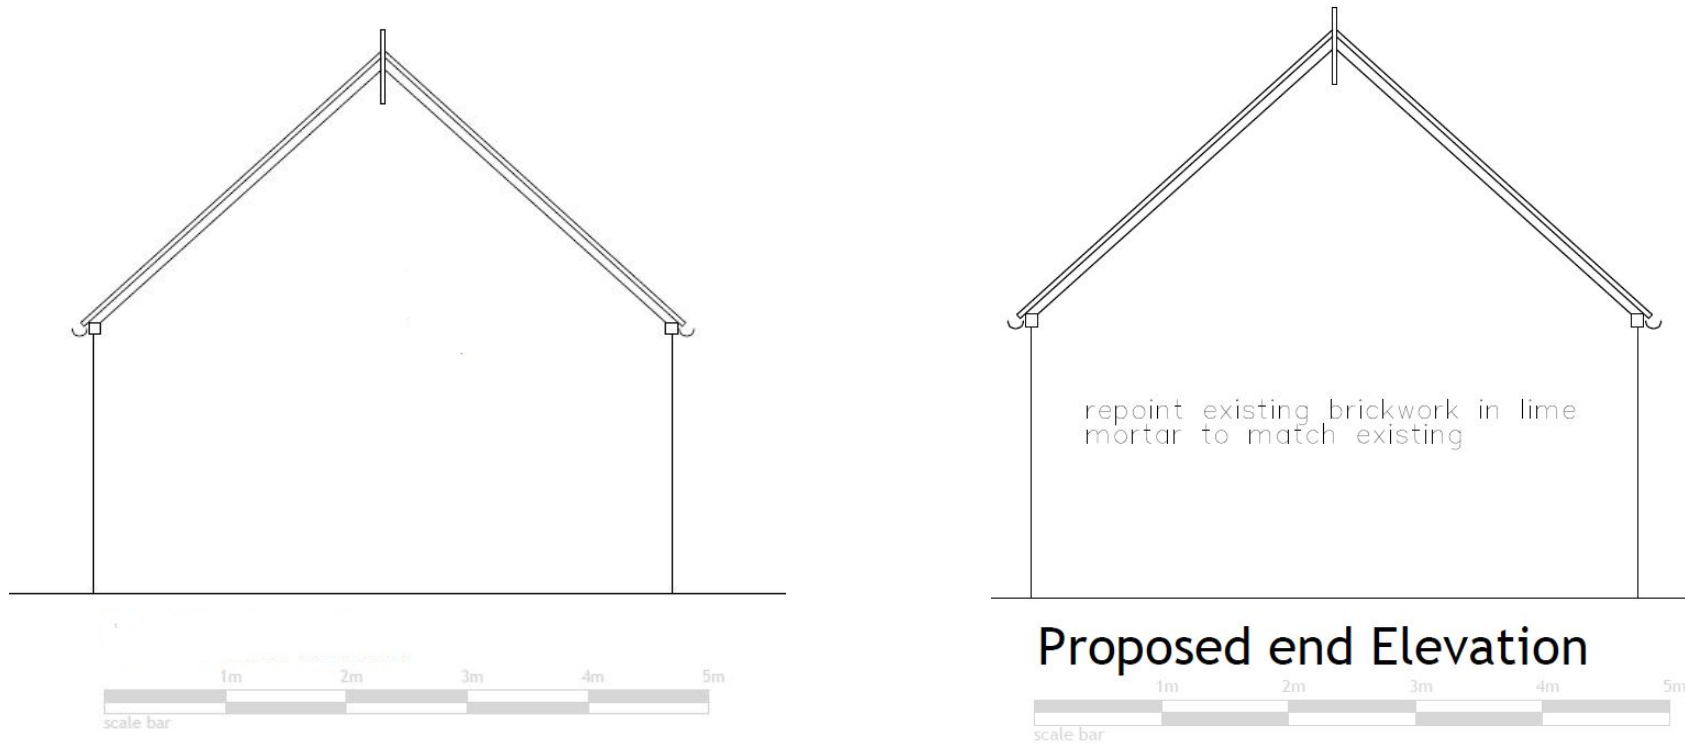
Drawings Showing Existing and Proposed Northern Gable Elevations
